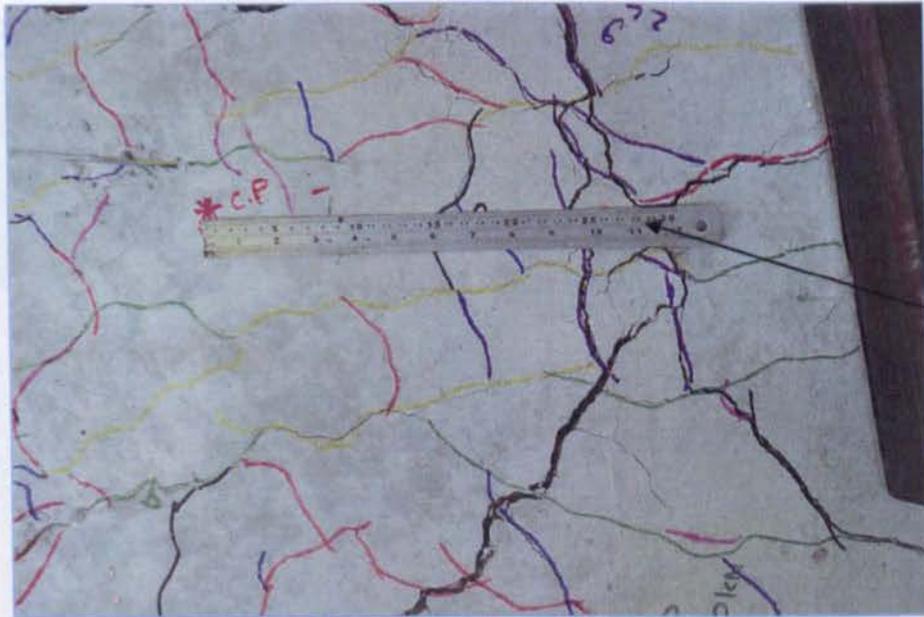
50PC/50GGBS slab specimen after failure
